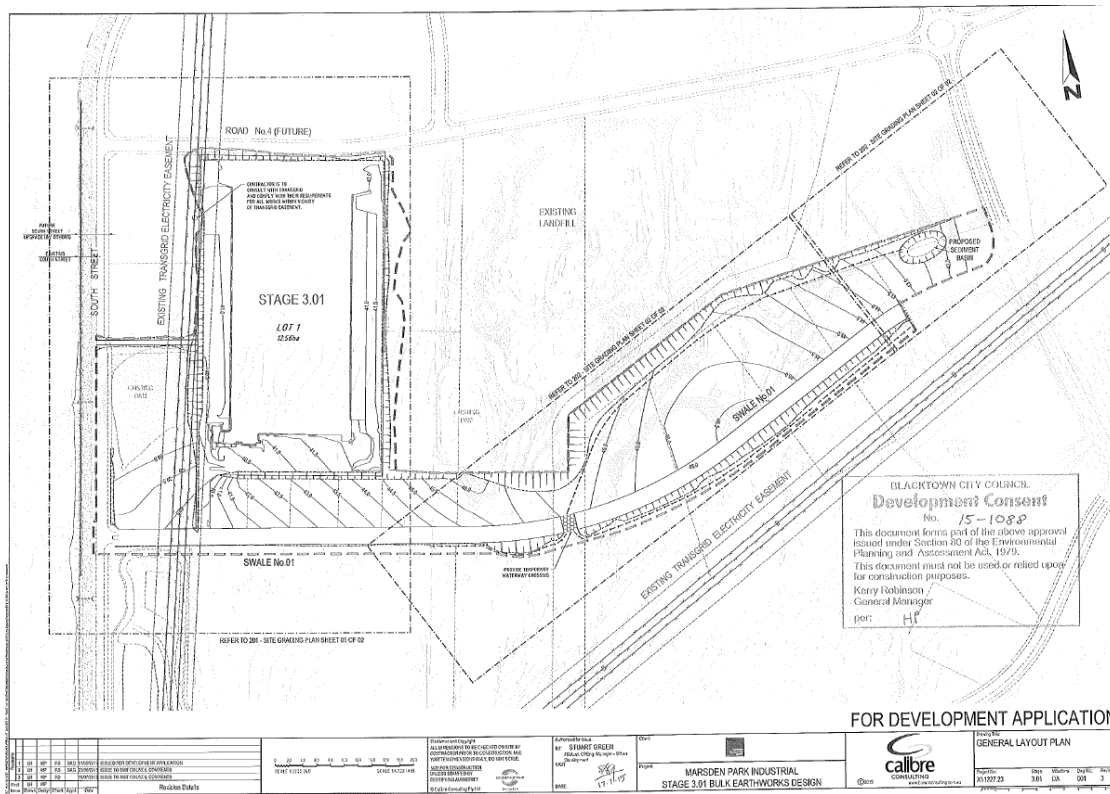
Approved Bulk Earthworks - General Layout Plan (DA15/1088)
